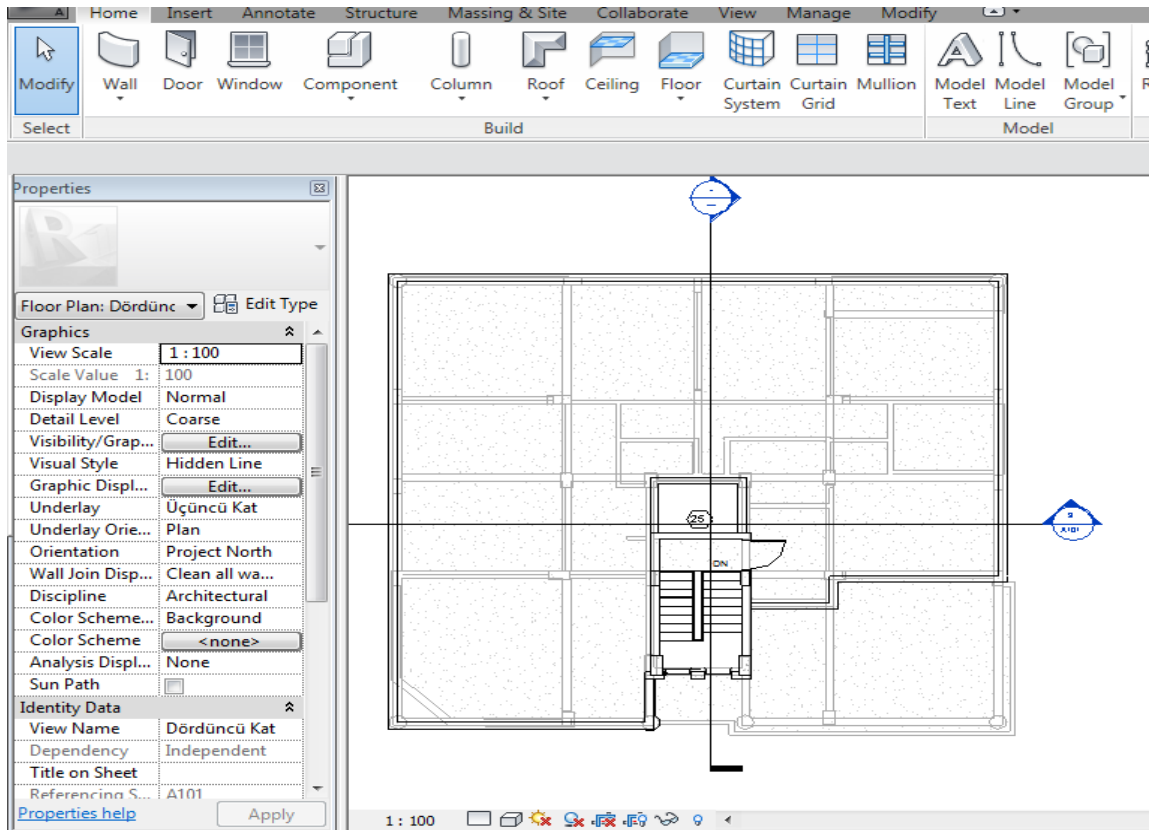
Penthouse plan of apartment building in Autodesk Revit Architecture
